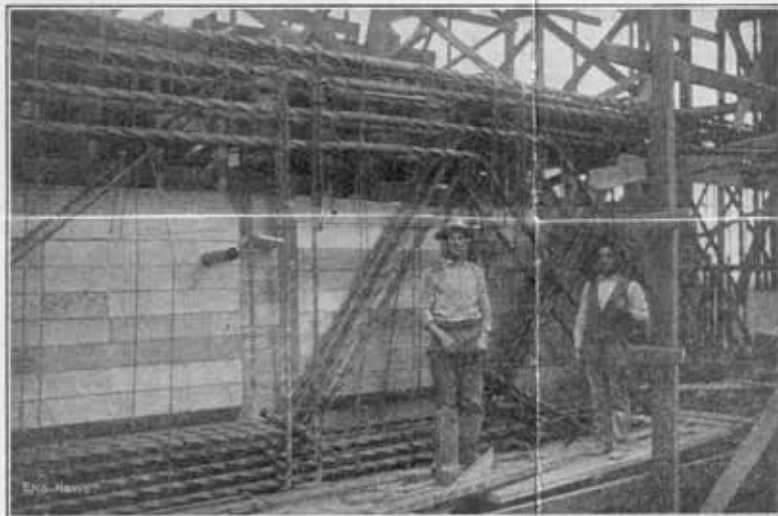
VIEW OF CONSTRUCTION OF ROOF-BEAMS, SHOWING SIZE AND LAYOUT OF REINFORCEMENT, MAJESTIC THEATER, LOS ANGELES, CAL.
